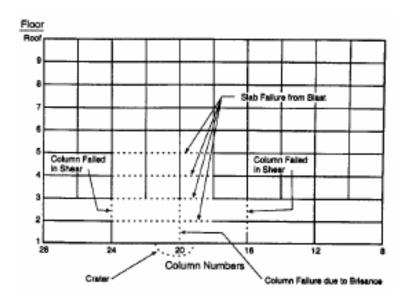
Schmatic of Blast Response, North Elevation of Nine Story Portion of Murrah Building at Column Line G. [20]
